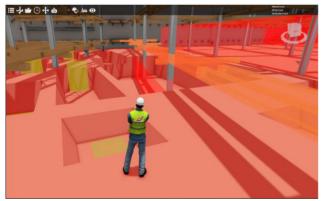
Adjusting the excavation and strutting construction scope to align with the structural construction schedule
